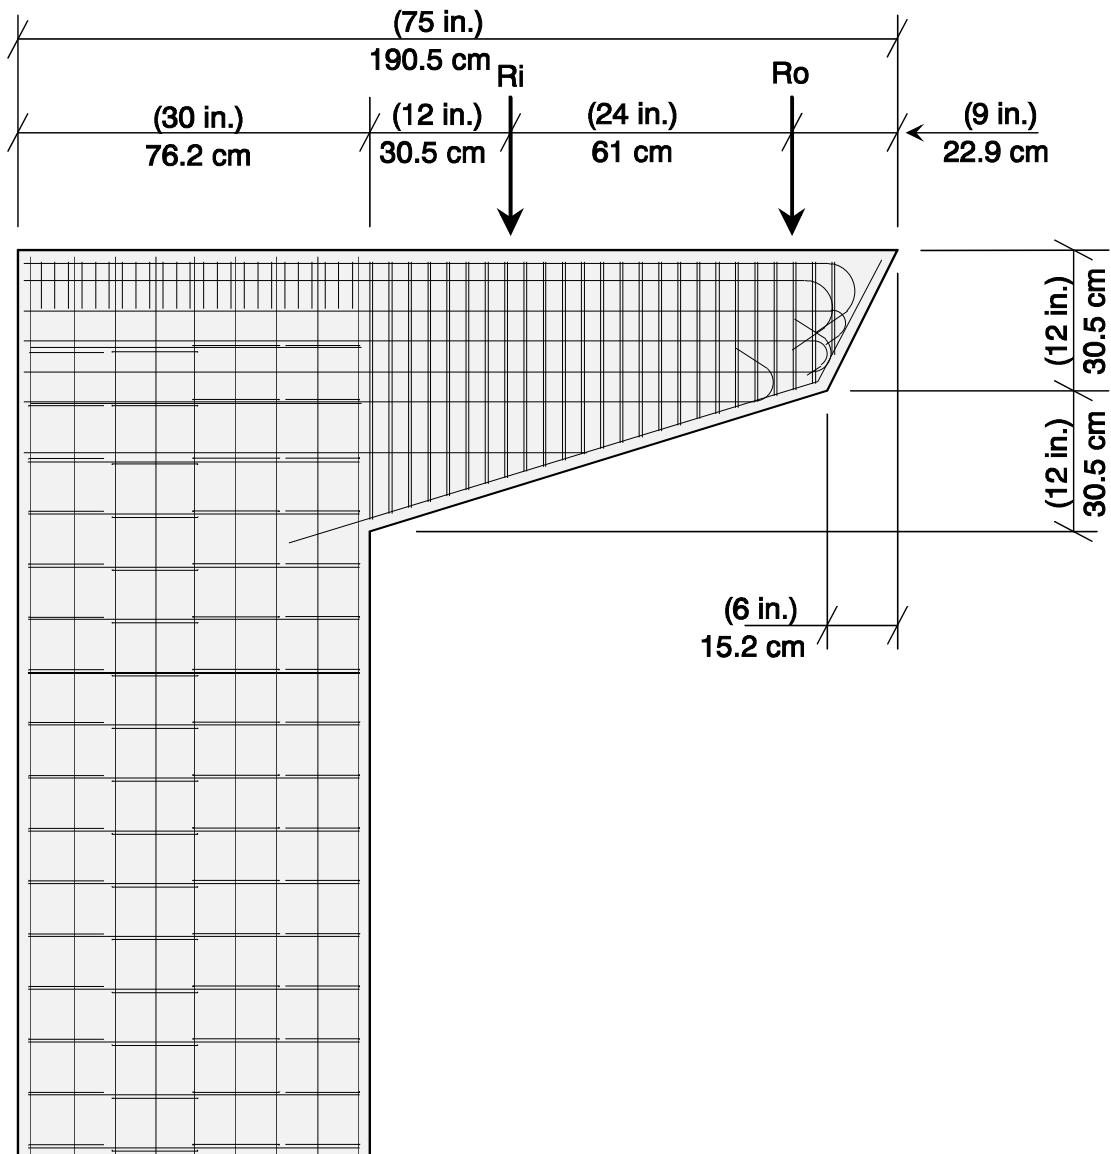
Layout of Reinforcement in Reinforced Concrete Bent [From Ref. 3]
